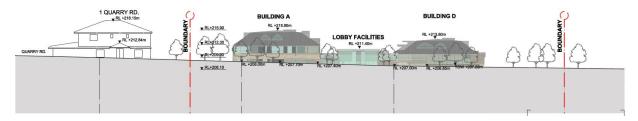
Elevations from Quarry Road looking North East towards Building A, Building D and the lobby.
